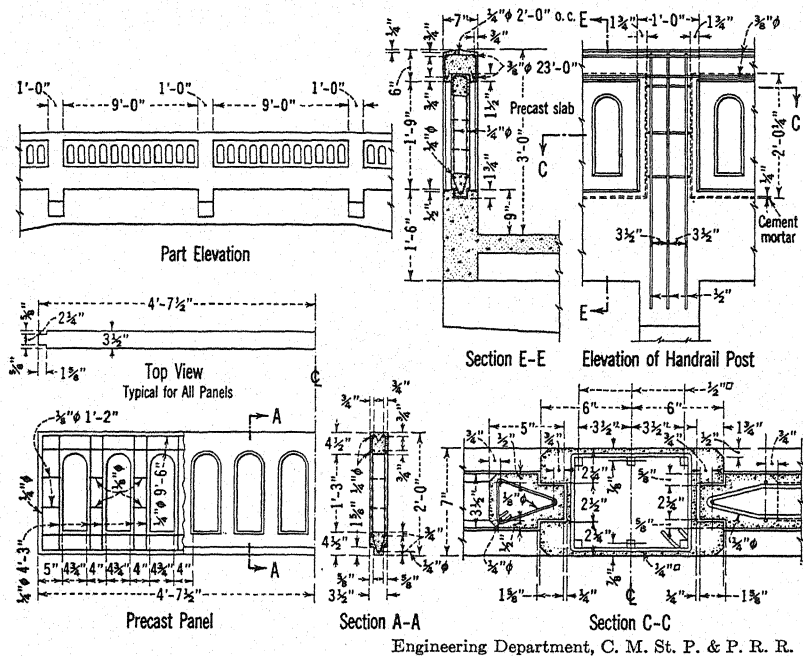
Railing with Precast Panels. Bridge at Monroe, Wis. (See p. 392.)
